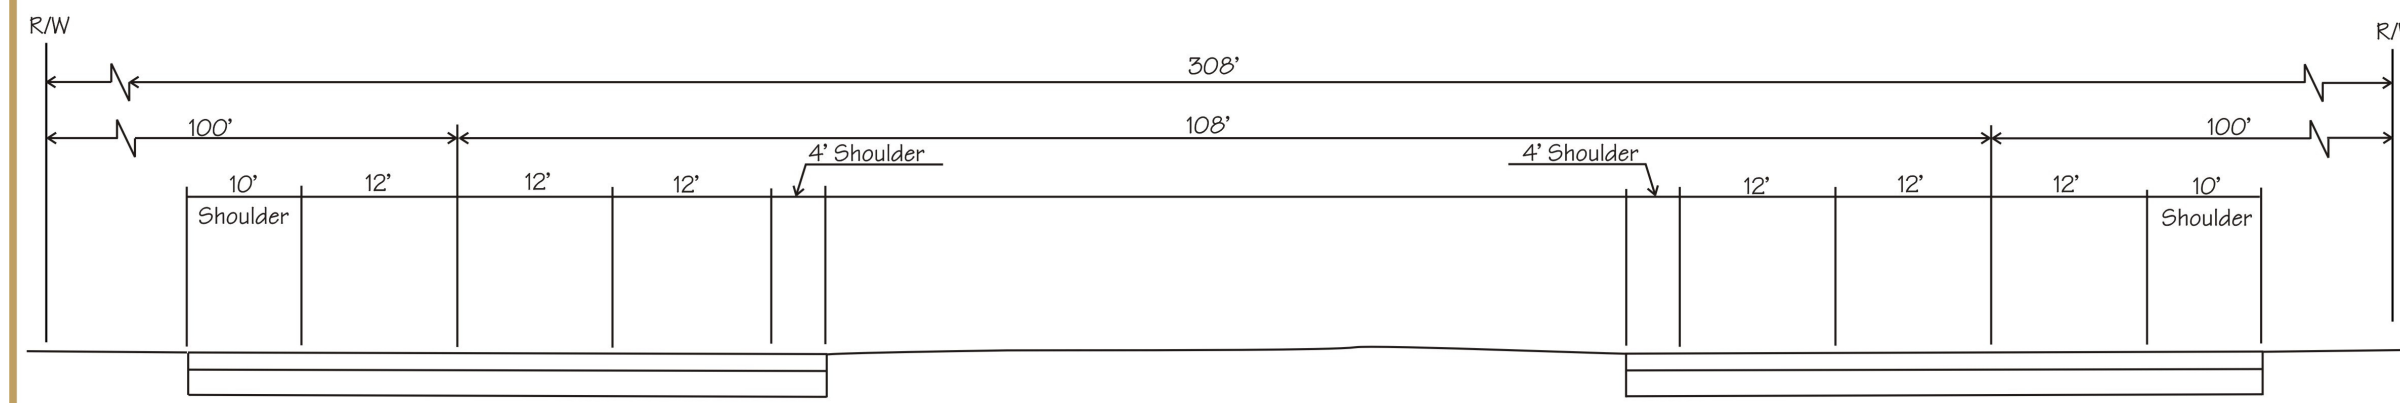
Typical Cross Sections (Parkway & Freeway)
